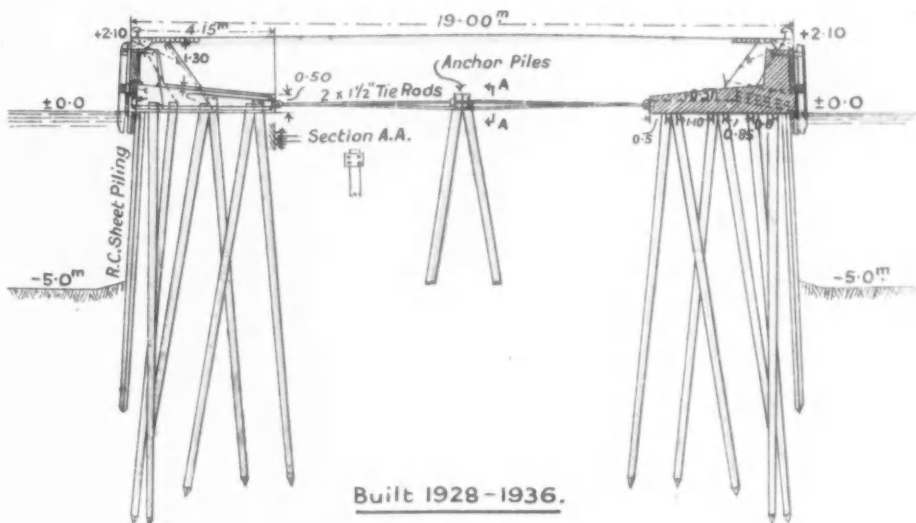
CROSS SECTION OF PIER "C"—PIPERVIKA.
